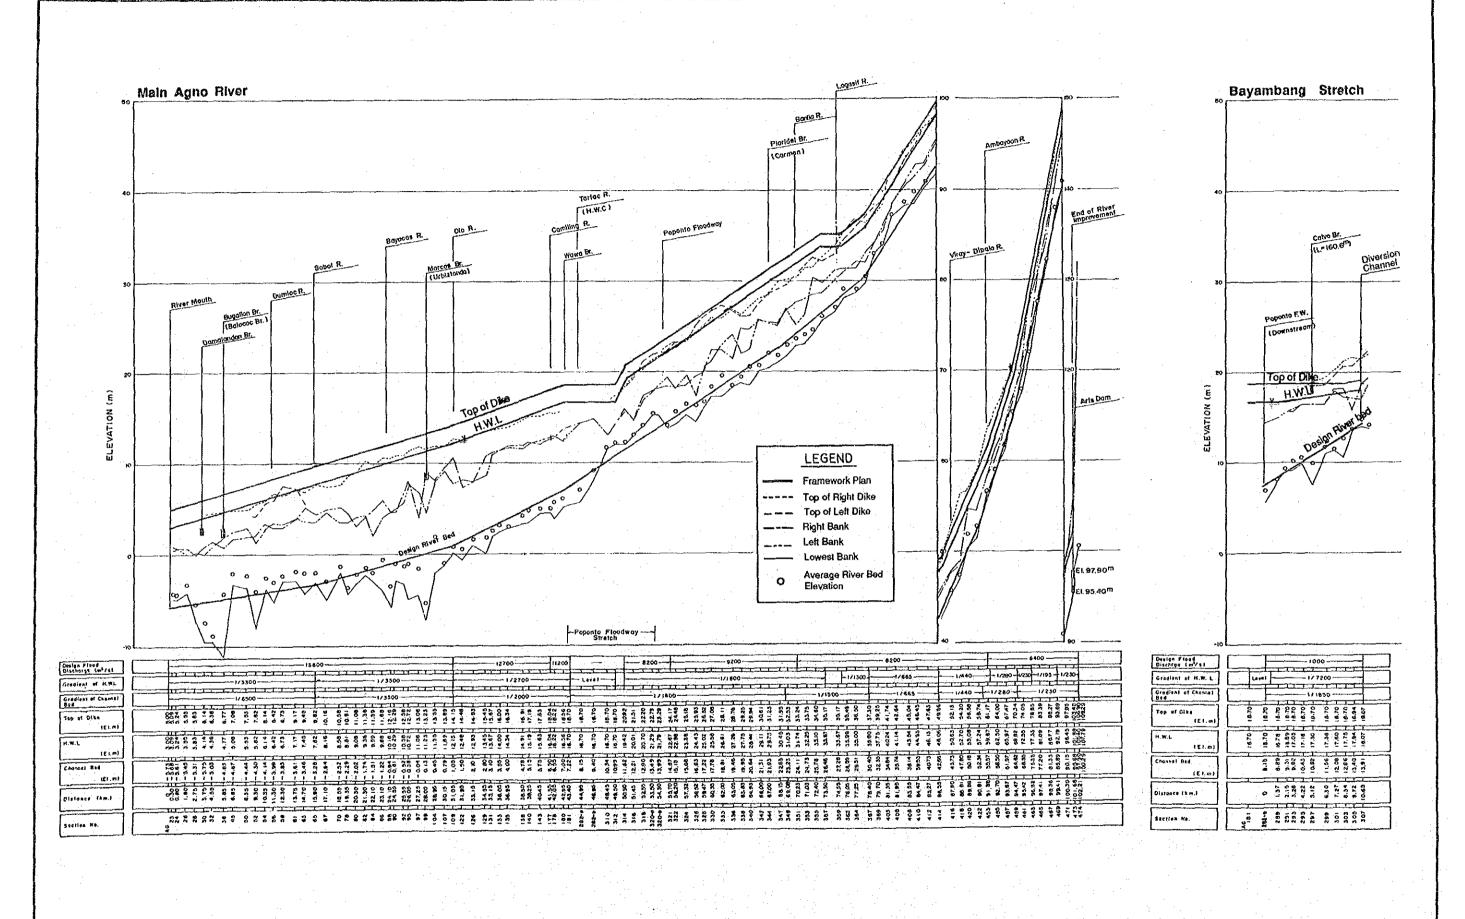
REVISED LONGITUDINAL PROFILE OF FRAMEWORK PLAN
